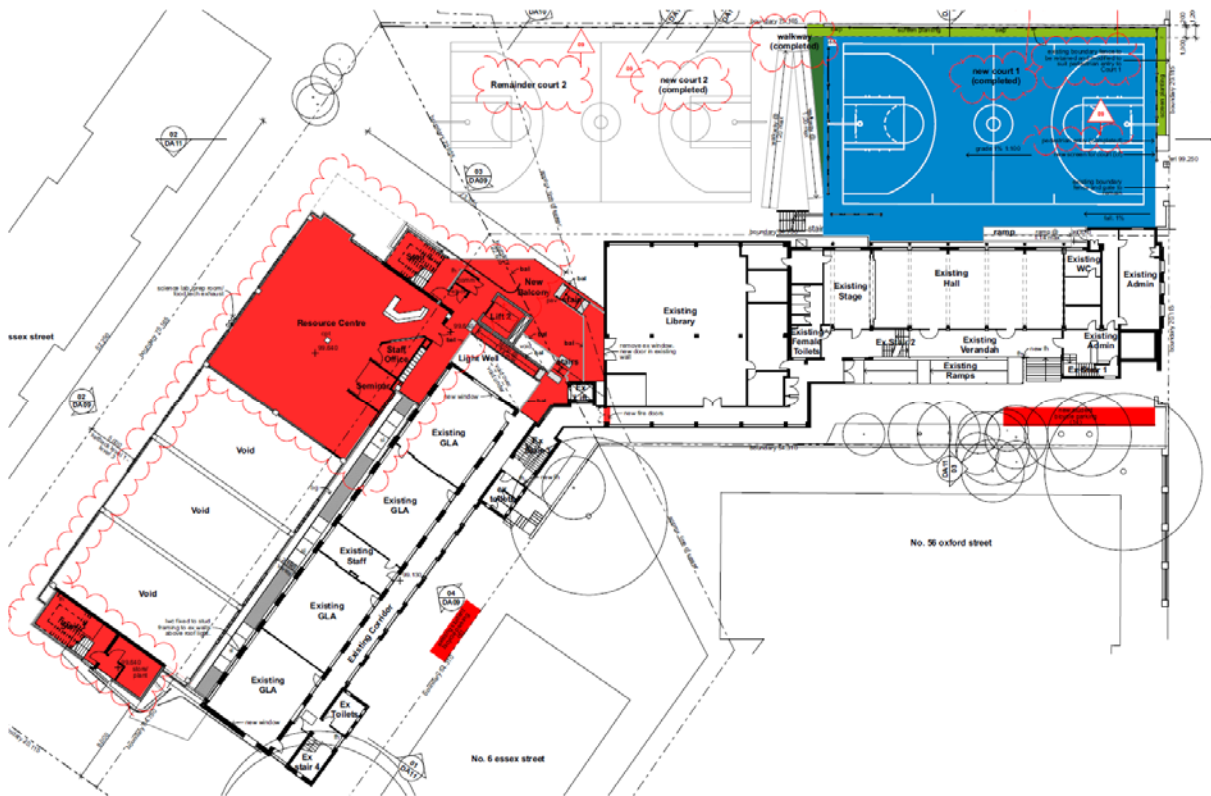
Proposed Level 3 plan under DA/89/2017/C.
